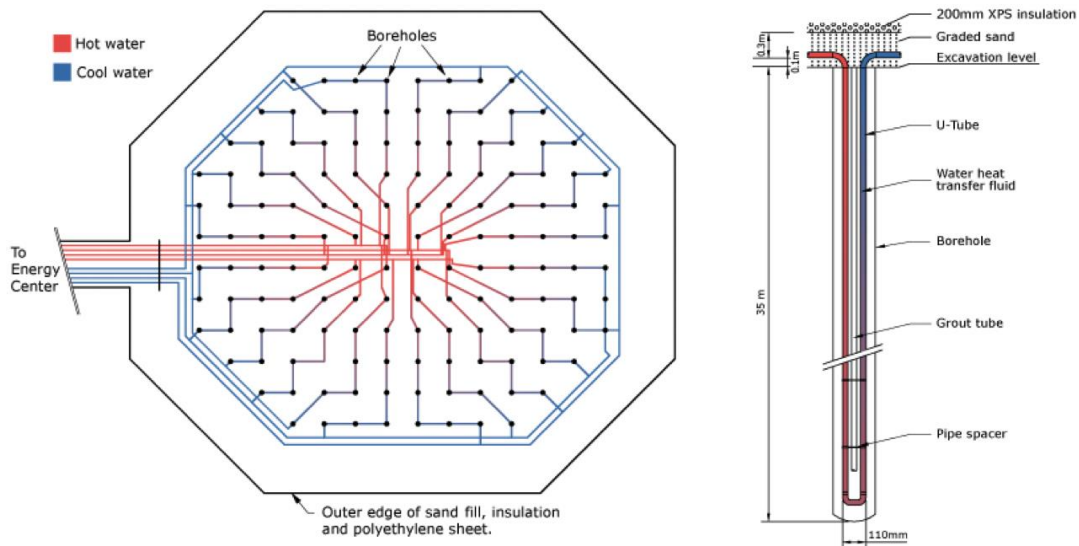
Example of a BTES layout and a BHE cross-section (Sibbitt and McClenahan, 2014).
